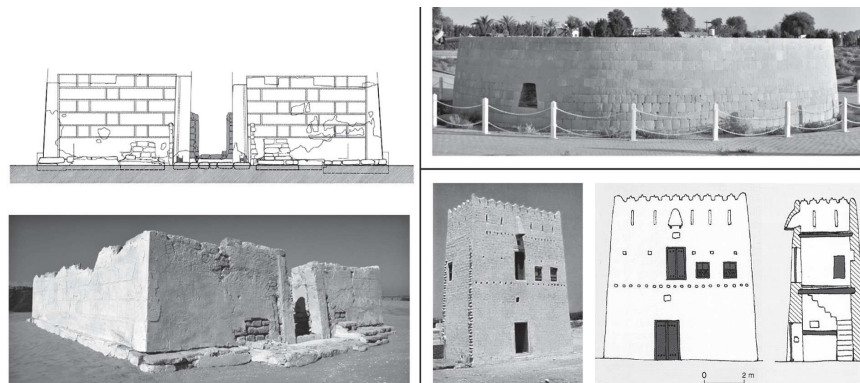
SE-Arabian monuments with reclining walls: 3rd millennium BCE Umm an Nar-type tomb at Mleiha (top right); 1st century AD temple at ed-Dur (left; after HAERINCK 2011, pls. 12 and B2); mud brick tower with inclined walls and battlements, 18th century AD summer residence at Falayah, Ras al-Khaimah (bottom right; after VELDE 2005, figs. 1, 13-14).
